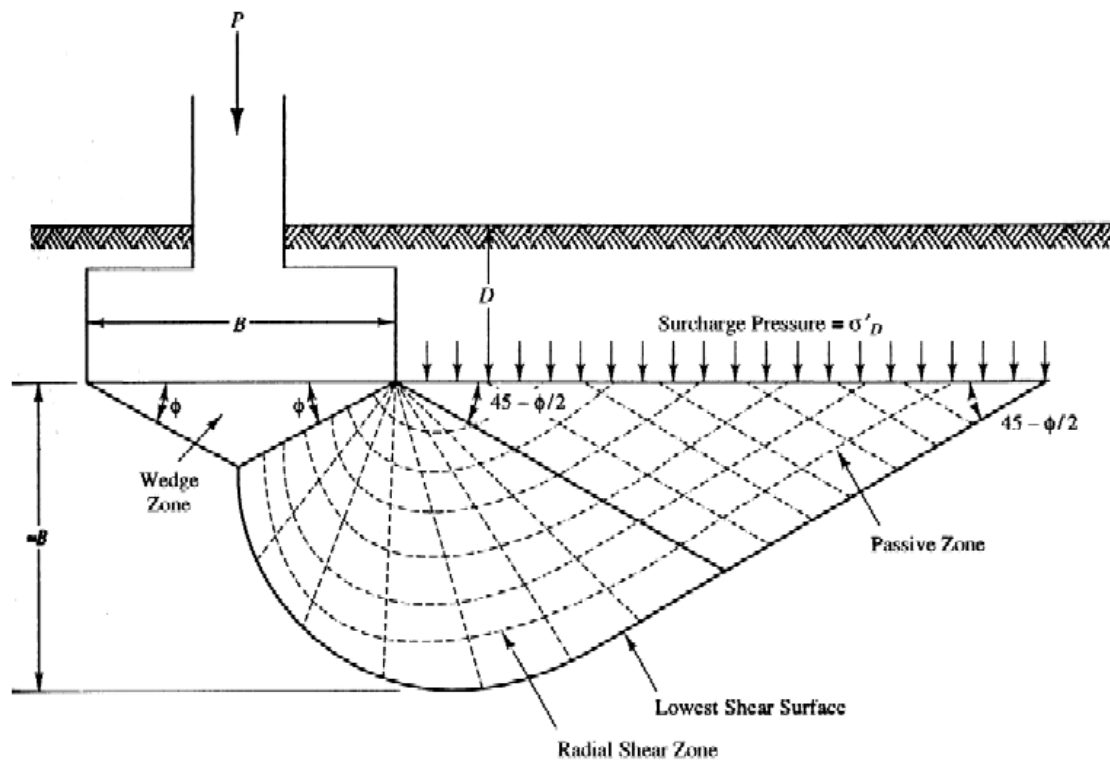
Terzaghi's concept of Footing with five distinct failure zones in foundation soil
